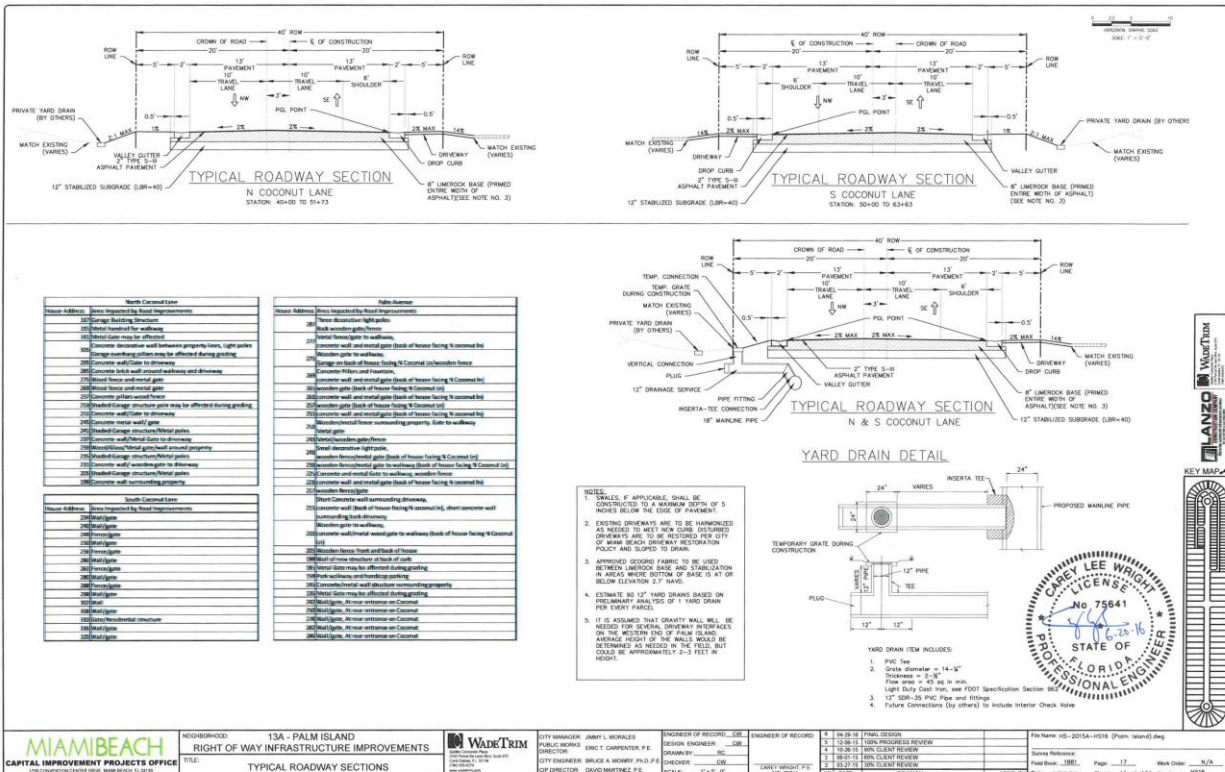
Excerpt from Wade Trim drawing of "Typical Road Way Section for North and South Coconut Lanes with inset drawing "Yard Drain Detail" that shows the connection tees for the
